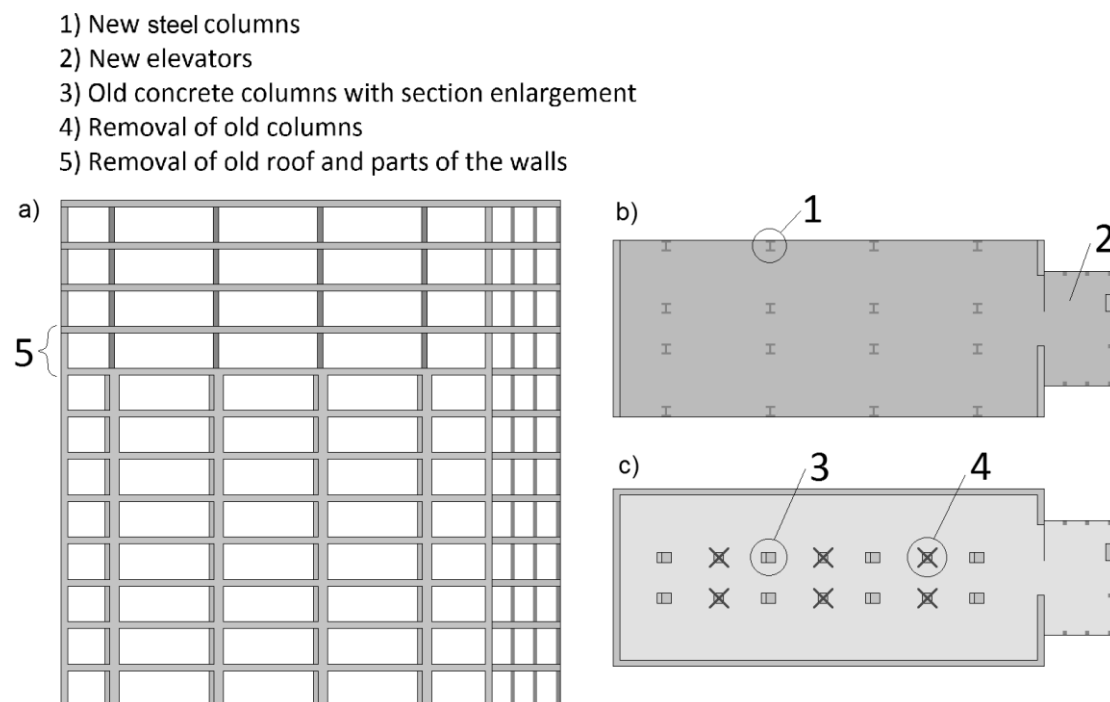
Structural system of HK60, a) section, b) plan of new part and c) plan of old part.
